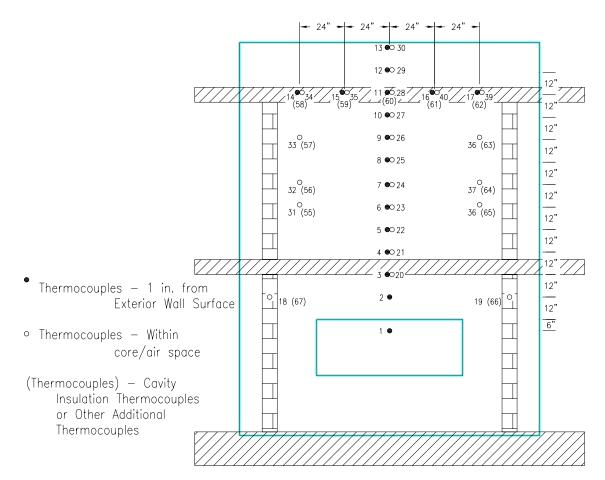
Instrumentation Arrangement (Exterior Face and Air Cavity).
